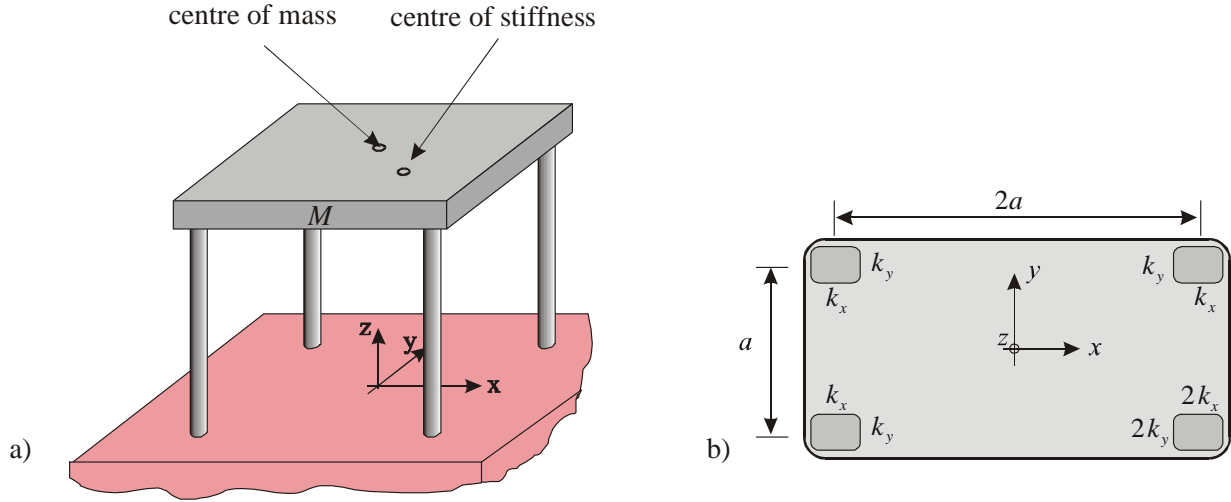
3D single story building a) schematics b) plane view with floor dimensions and column stiffness
